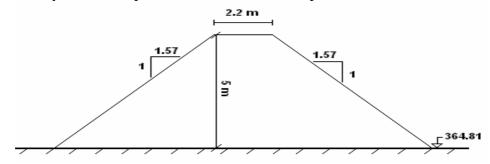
Standard cross-section of the 2C-02 gravel dam.
